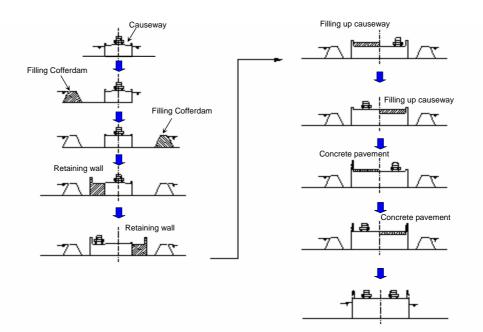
Staged Construction for Periya Kallar & Koddaia Kallar
